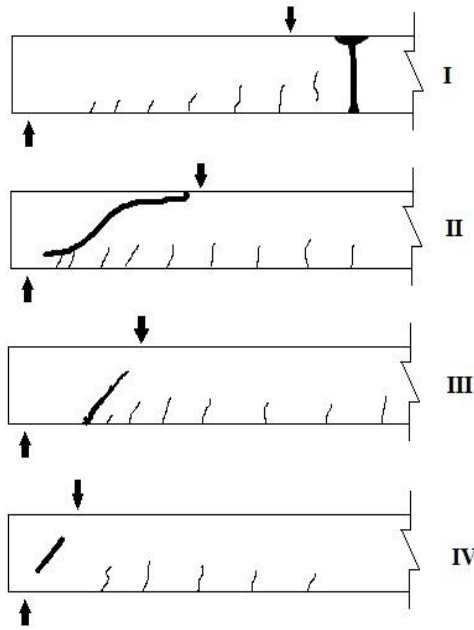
Types of behavior exhibited by beams under 2-point loading.
